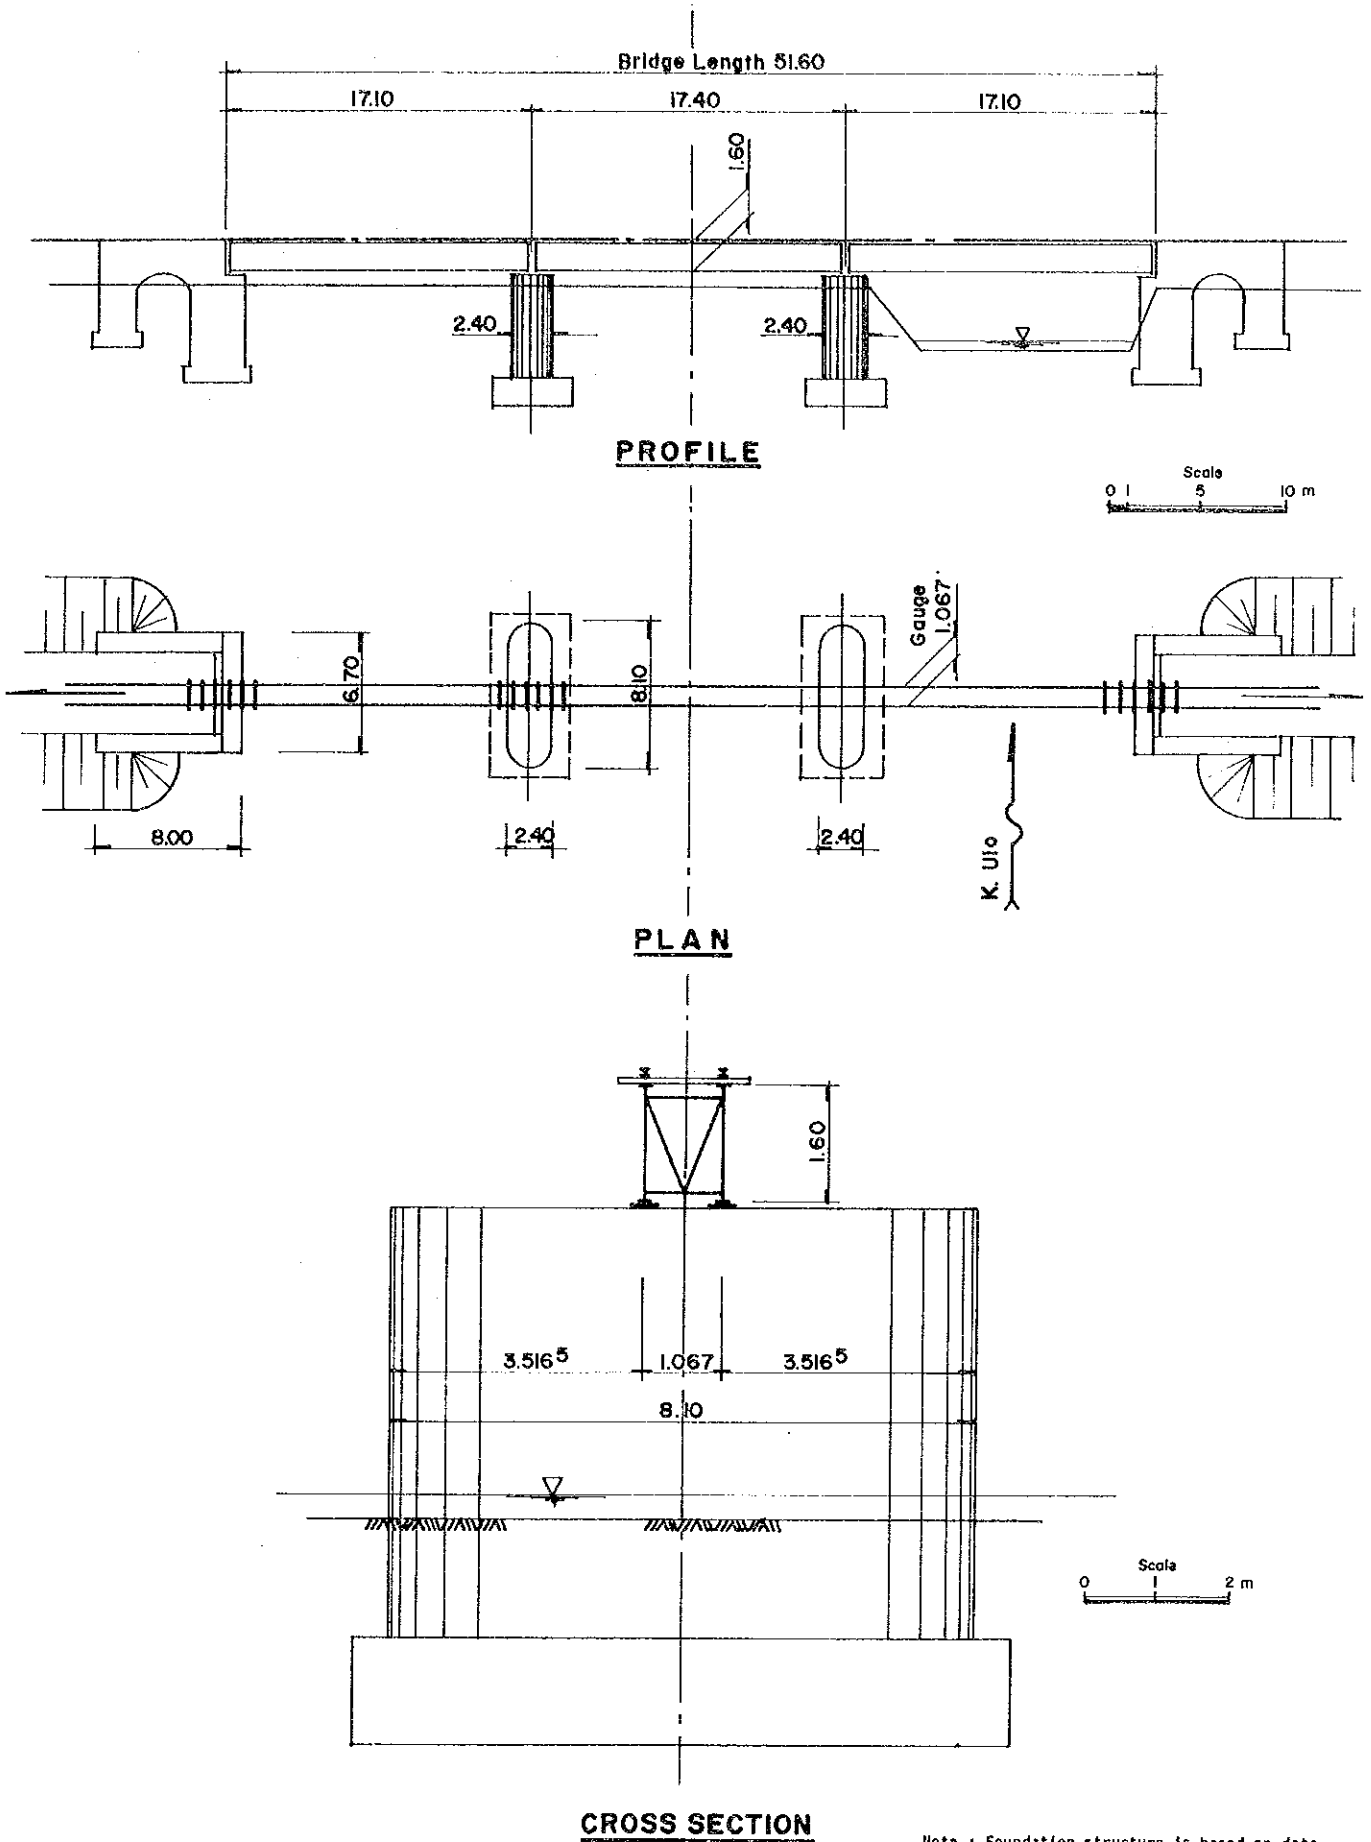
K. ULO RAILWAY BRIDGE (3/5)
